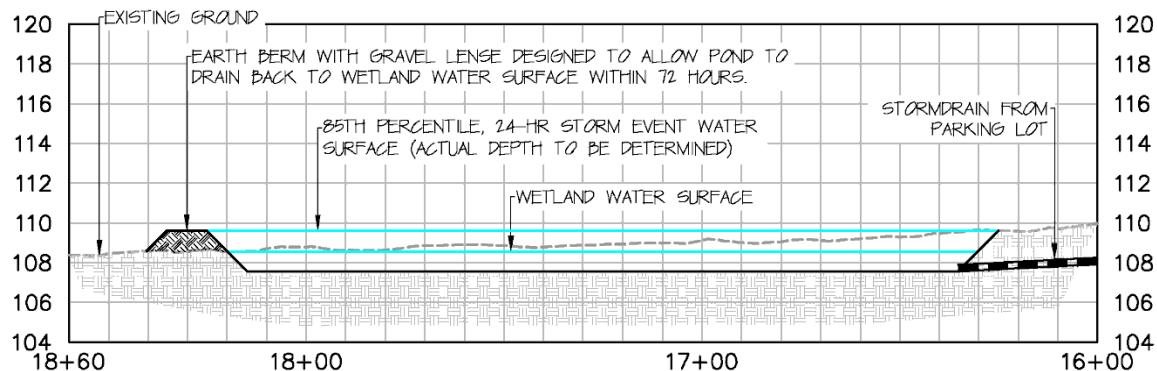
Profile view of detention/retention basin to treat new parking lot stormwater.
